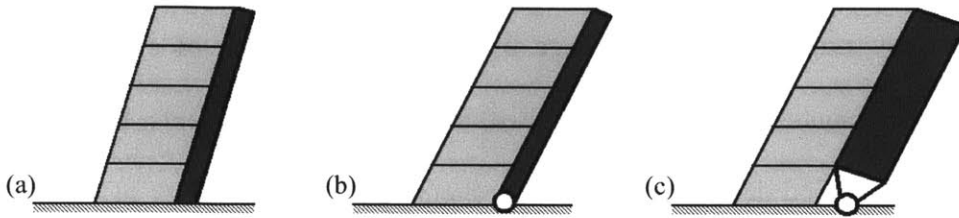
Schematic illustration of a simple unfixed shear wall contrasted with a rocking wall system. (a) Building with fixed shear wall, (b) Building with unfixed shear wall, (c) Building with rocking wall
